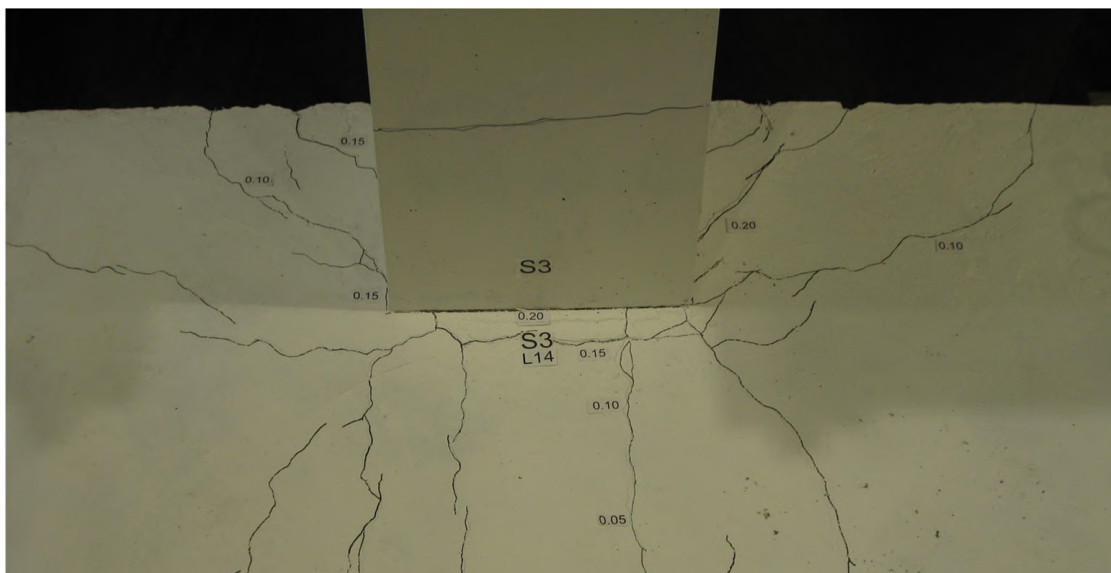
Specimen 3 slab cracks at $V = 154.9$ kN
